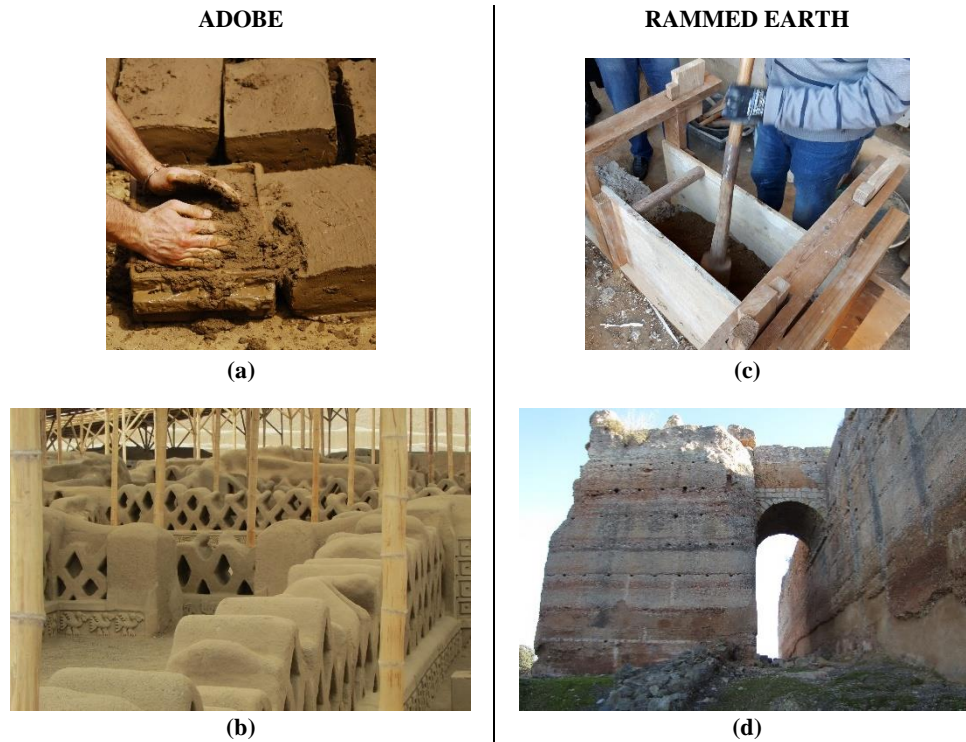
Earthen construction: (a) Adobe technique; (b) Chan Chan archaeological site, Peru (construction made with adobe blocks); (c) Rammed earth technique; (d) Paderne Castle, Portugal (construction made with rammed earth).
